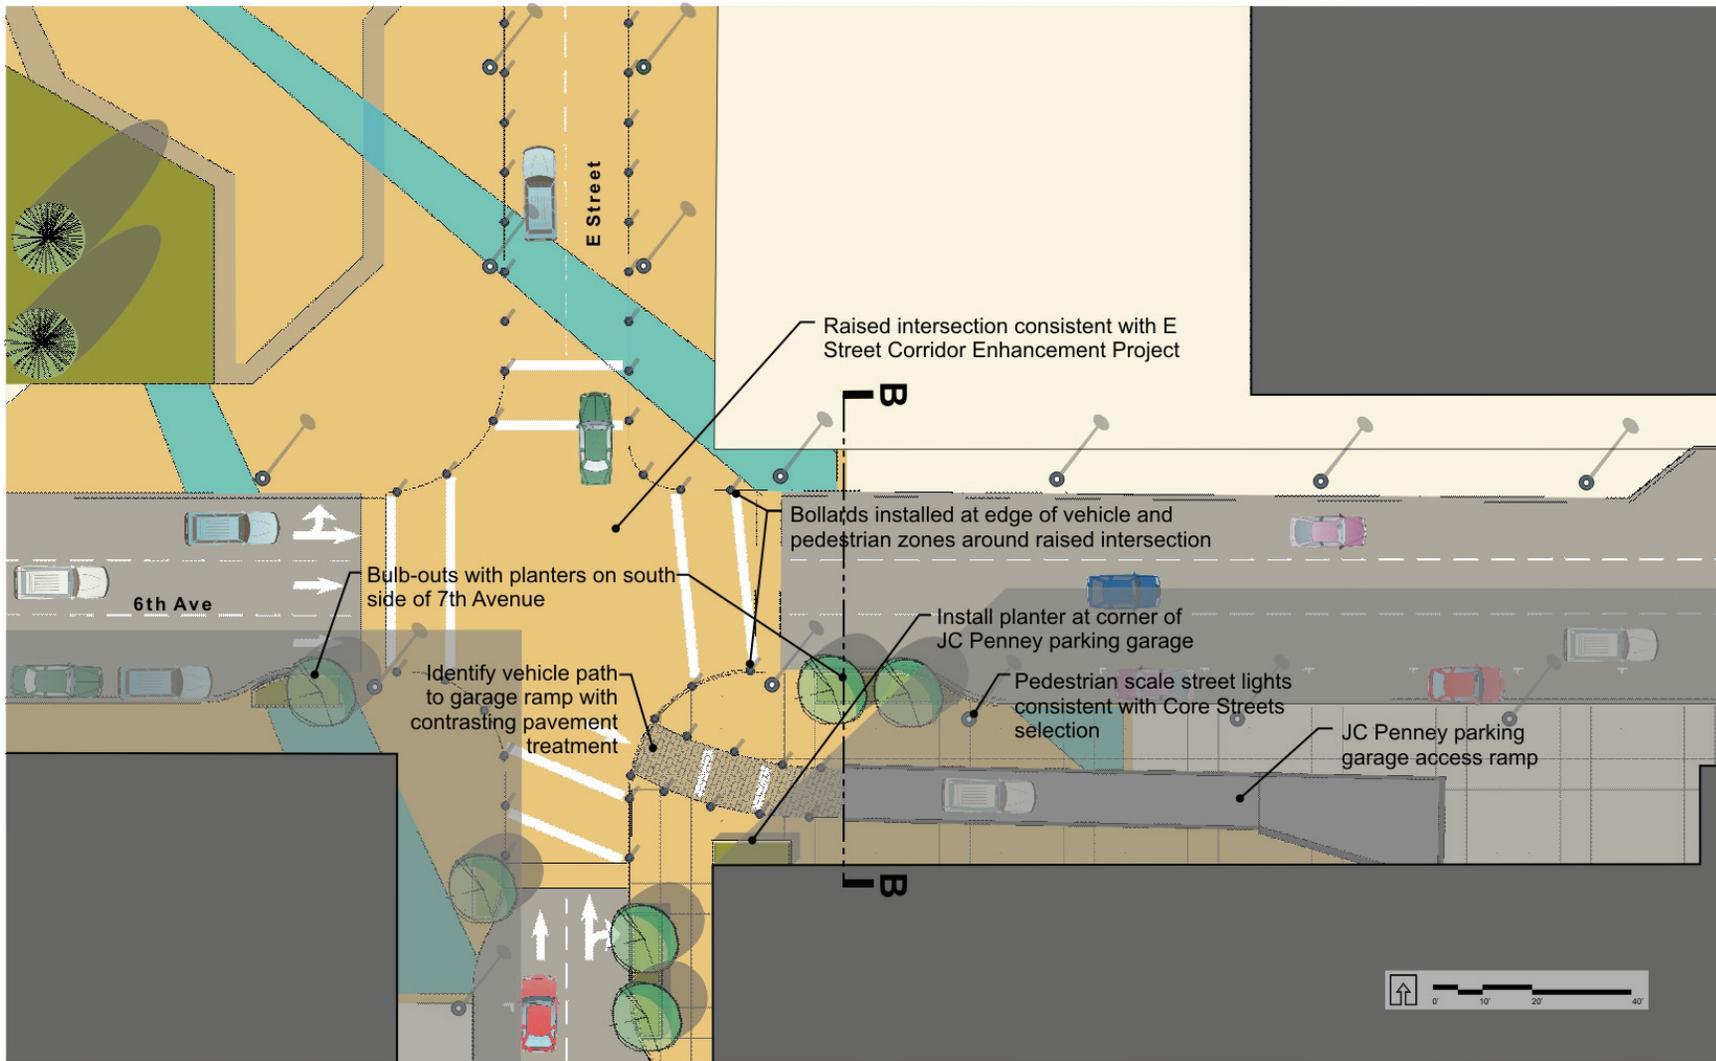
Proposed 6<sup>th</sup> Avenue Layout
